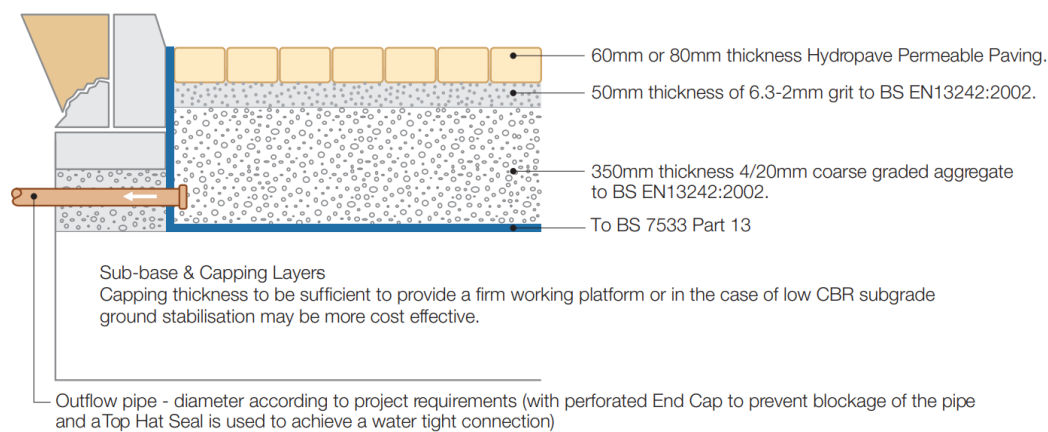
Typical Section Through Permeable Paving in Parking Spaces
